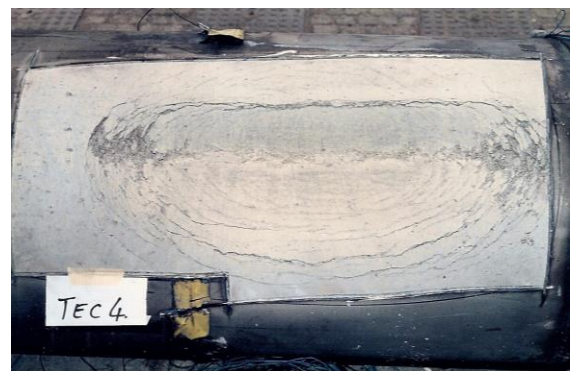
Typical of the concrete failure surface after removal of the outer steel skin (Tec4)
